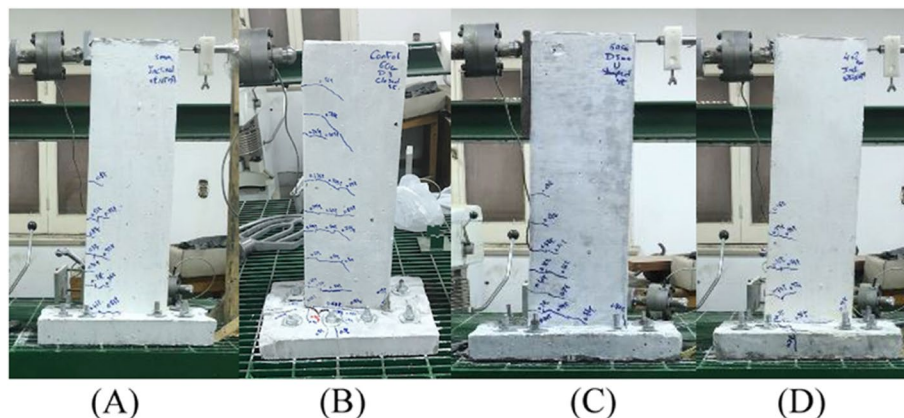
Walls with varying stirrup detailing from A inclined stirrups with 3mm VL RFT, B closed stirrups, C U-shaped stirrups, and D inclined stirrups with 4+2mm VL RFT
